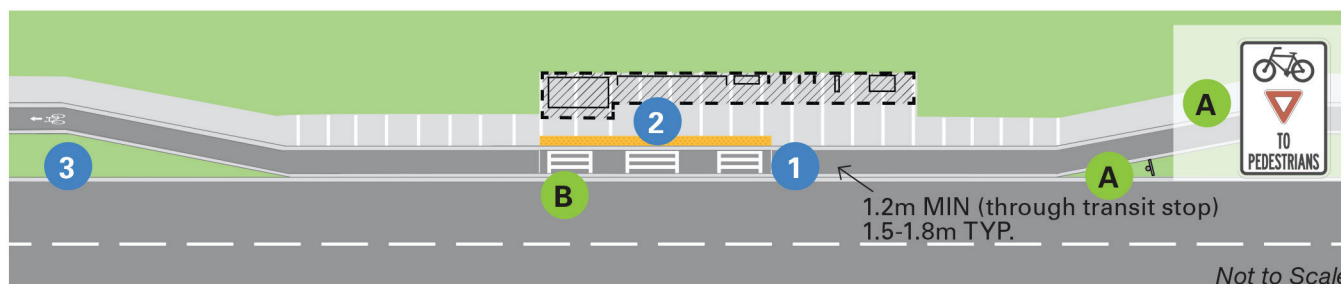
Separated Bikeway and Sidewalk with Transit Concept - Constrained
